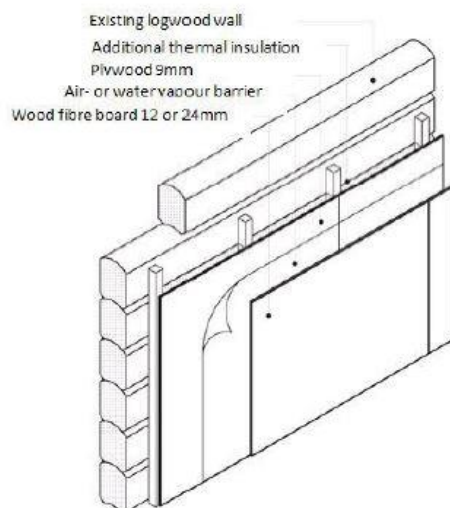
Example of insulation layer on the inner side of an external wall /1/
